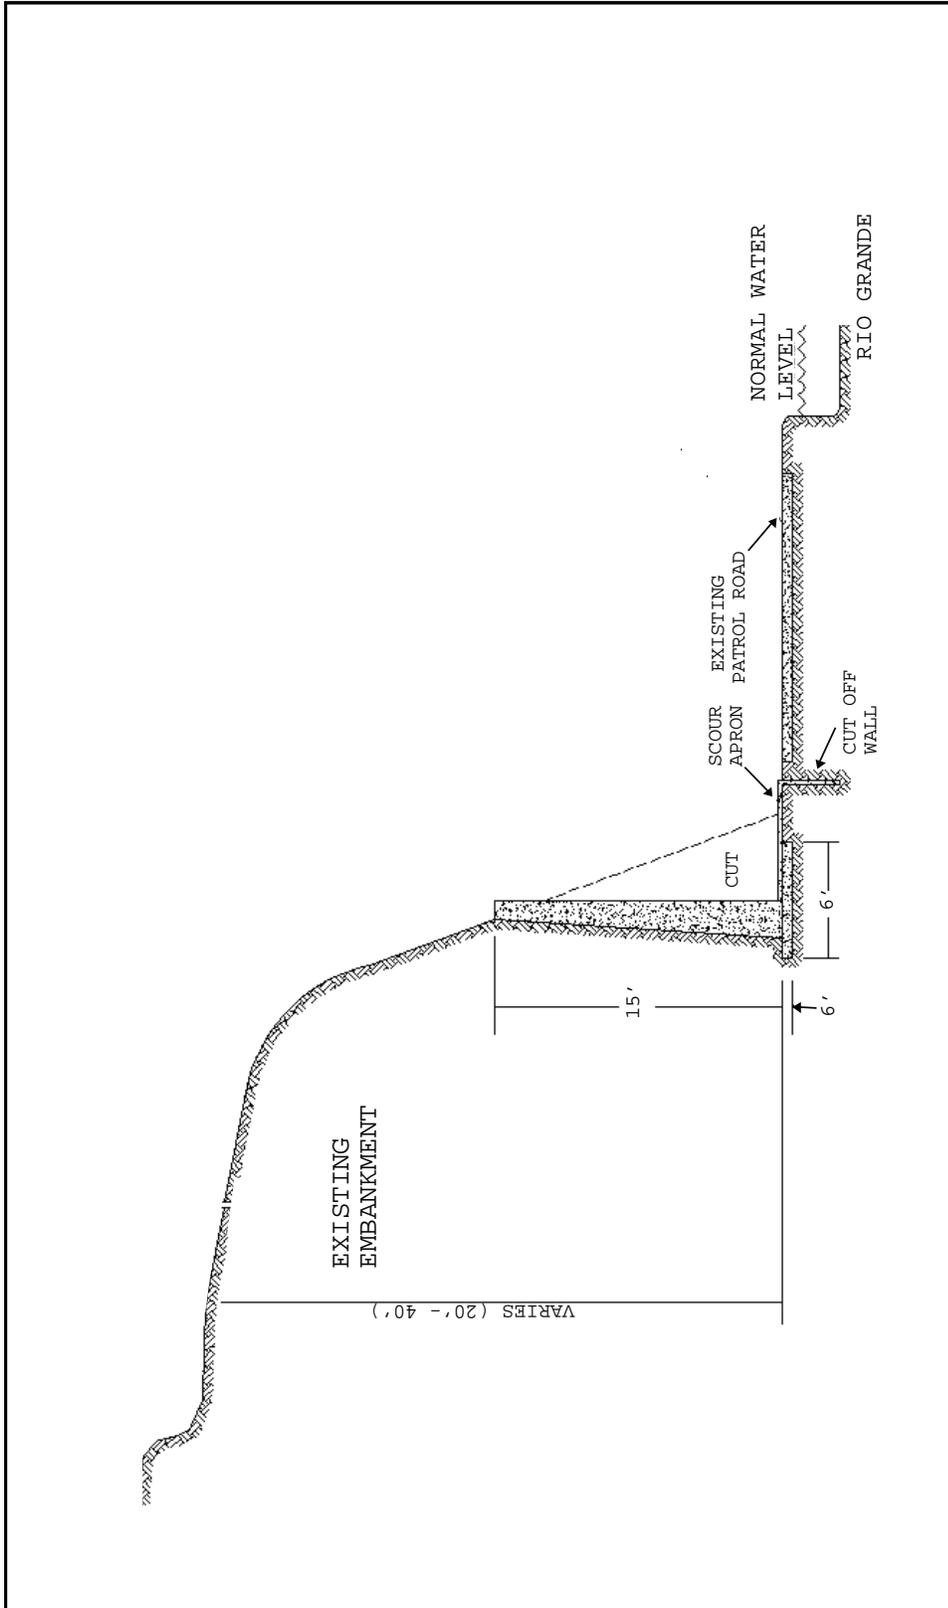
Schematic of Concrete Retaining Wall – Alternative 2, Section M-2A
